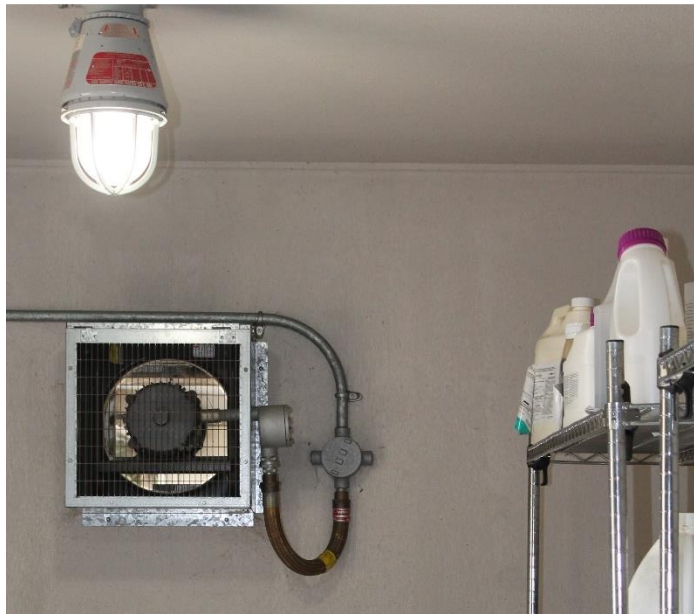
Pesticide storage areas must be adequately ventilated. Photo Credit: Erik Ervin.
